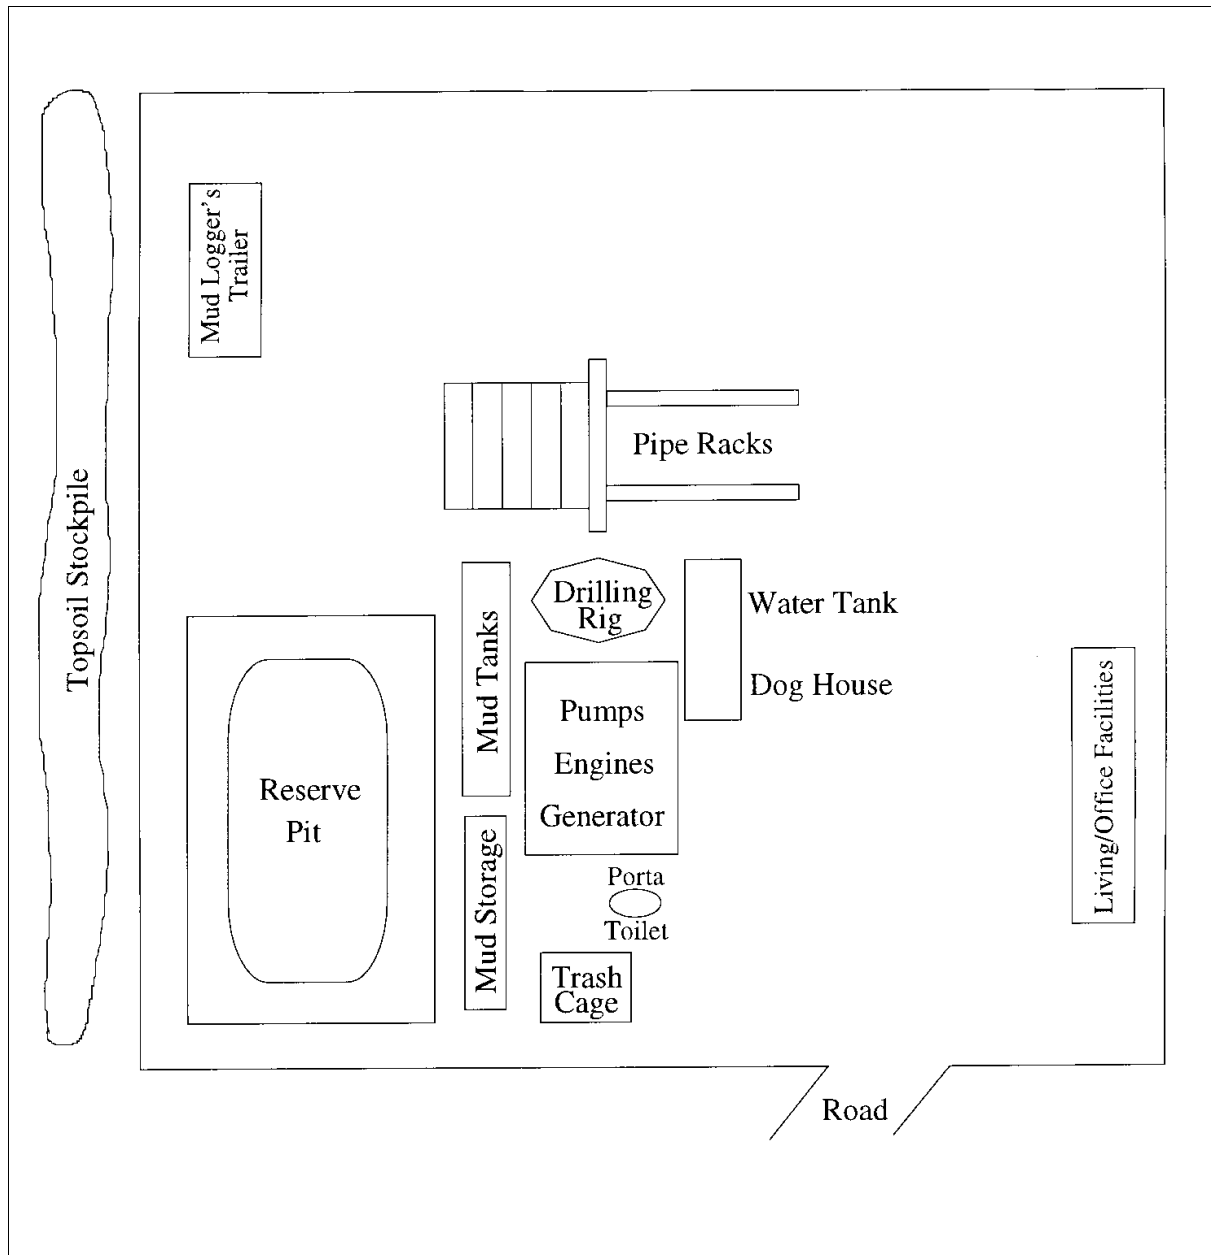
Schematic plot plan of a typical drilling pad layout.
